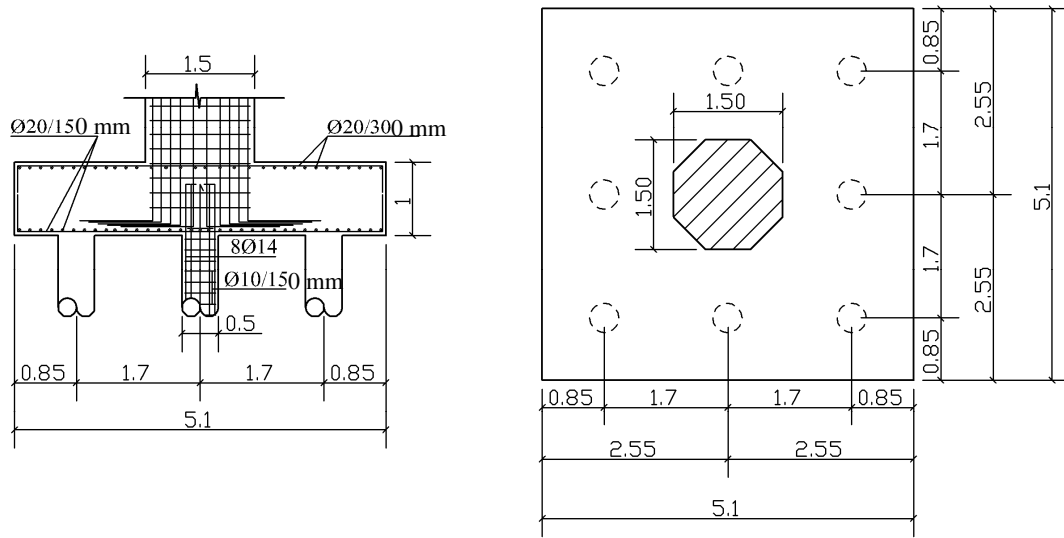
Alnasha Bridge Pier #4 and Pier #5 pile footing details (Dimensions in meter).
